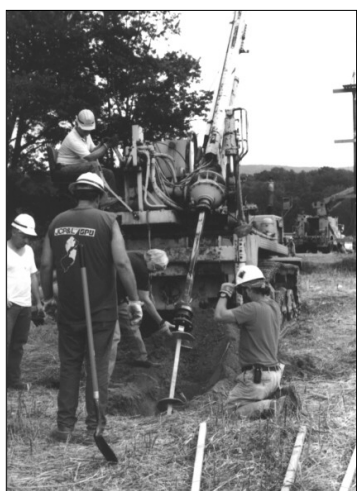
Drive rig, kelly bar adapter, and shear pin torque indicator all in line. *Photo courtesy of Mr. Tibor Latincics.
